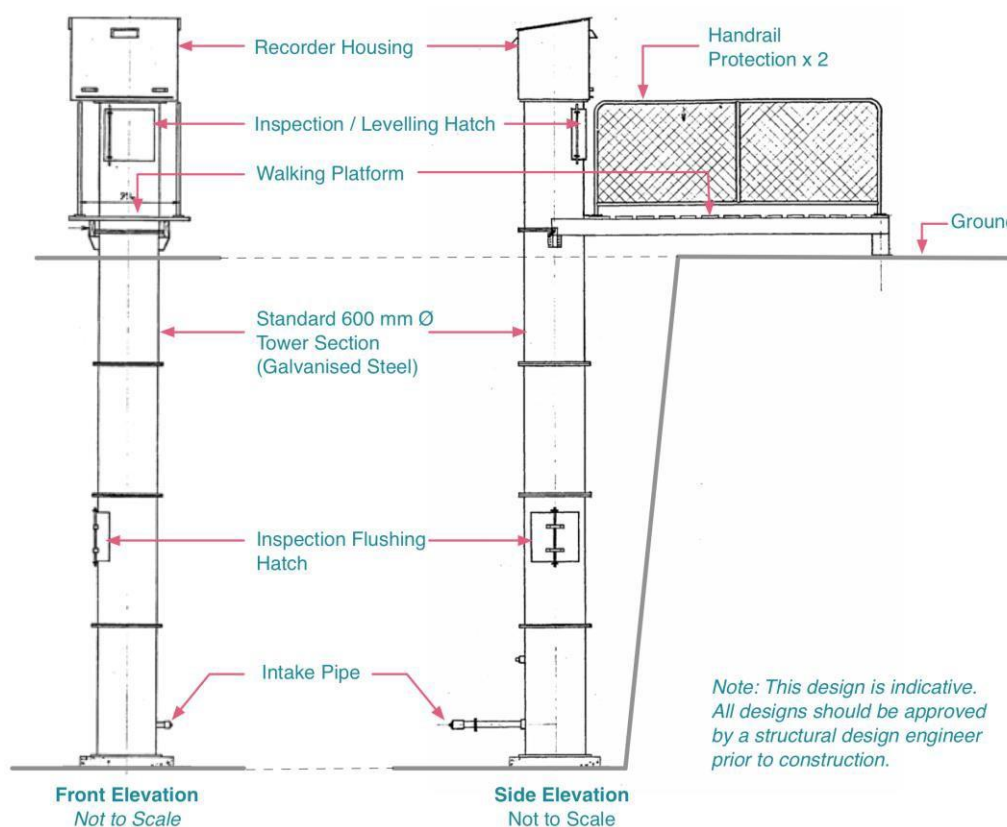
Typical stilling well and housing setup – MWD 'standard' steel stilling well
